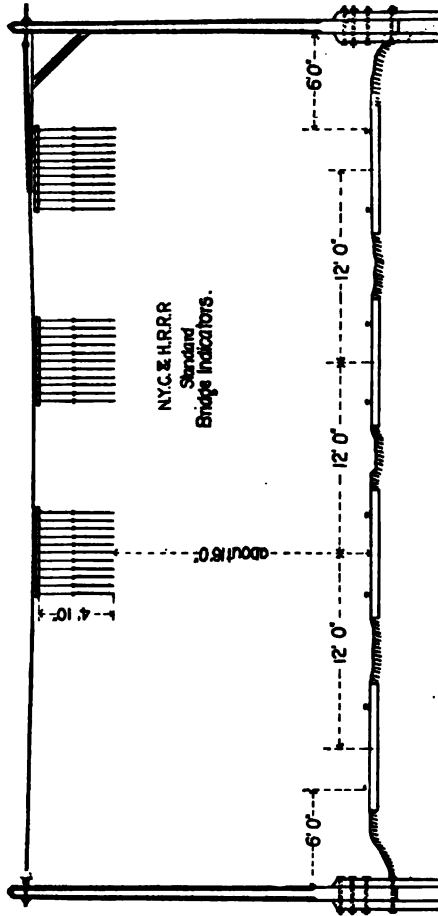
BRIDGE INDICATOR, NEW YORK CENTRAL AND HUDSON RIVER R. R.
